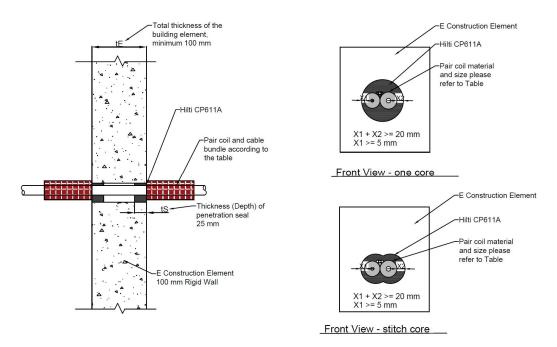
Single pair coil and cables penetrating 100 mm thick rigid wall
